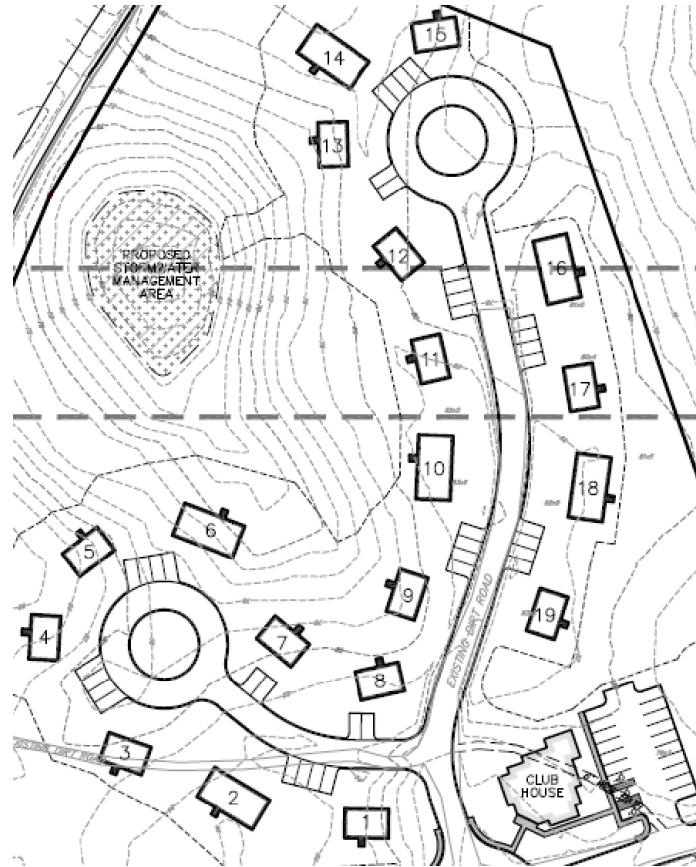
North side of planned housing development off of Meetinghouse Road in Mashpee, MA. Few houses are currently facing north-south, which is the best roof orientation for rooftop solar PV.
